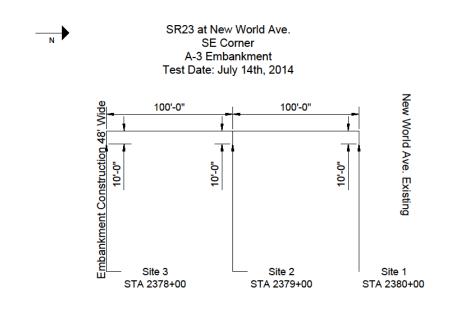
Project Site #6 SR-23 A-3 embankment - Test site location sketch
